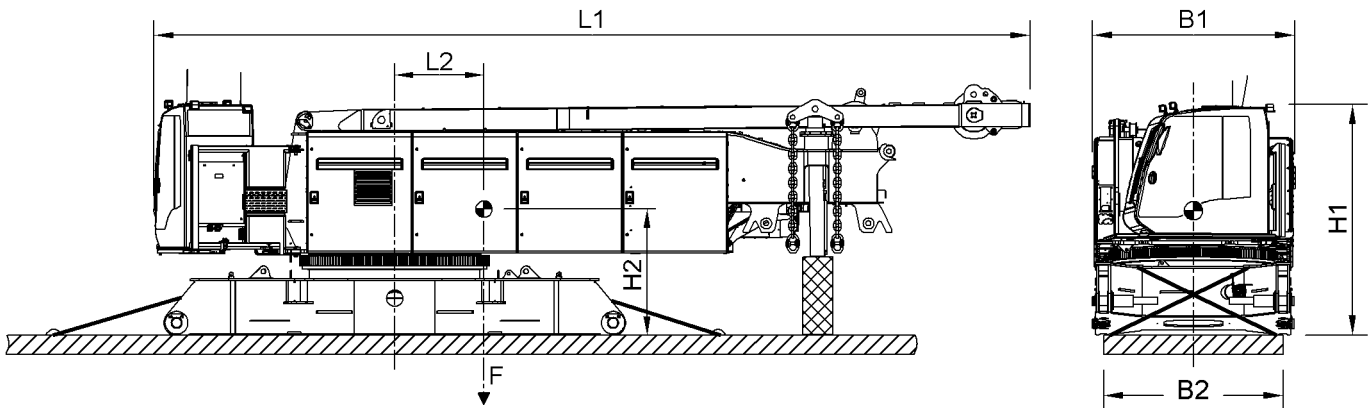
Dimensions of transporting the basic machine with a low loader
